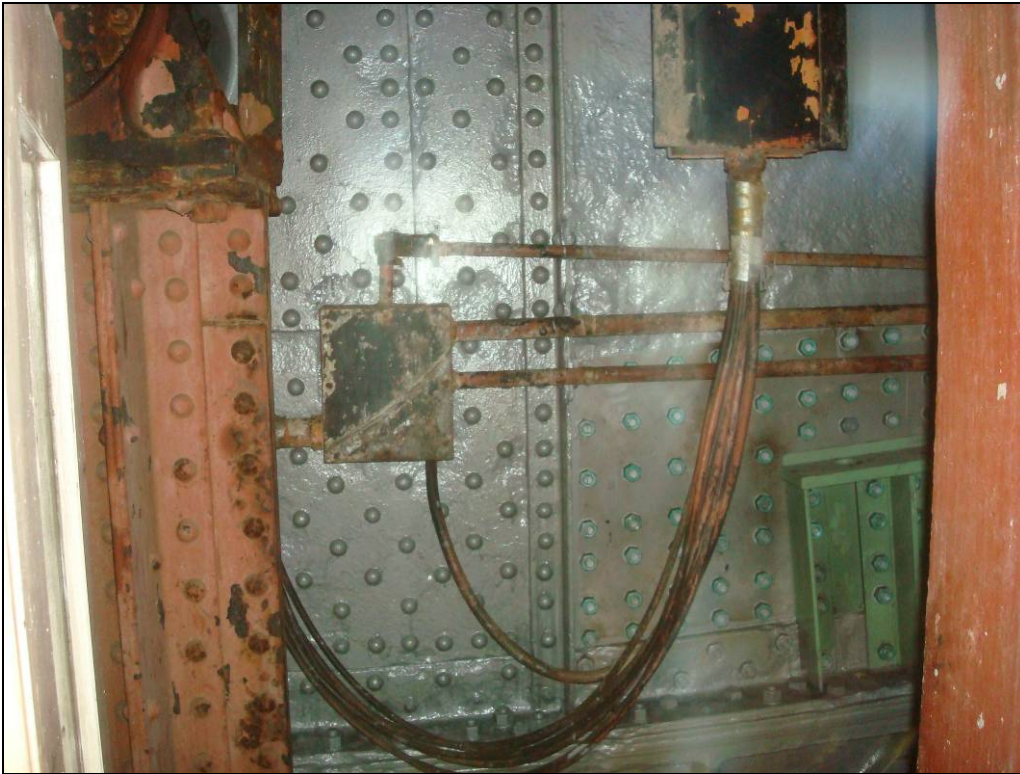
The painters primed the Southeast bascule girder and a portion of the rack at the trunnion area. East face shown.
